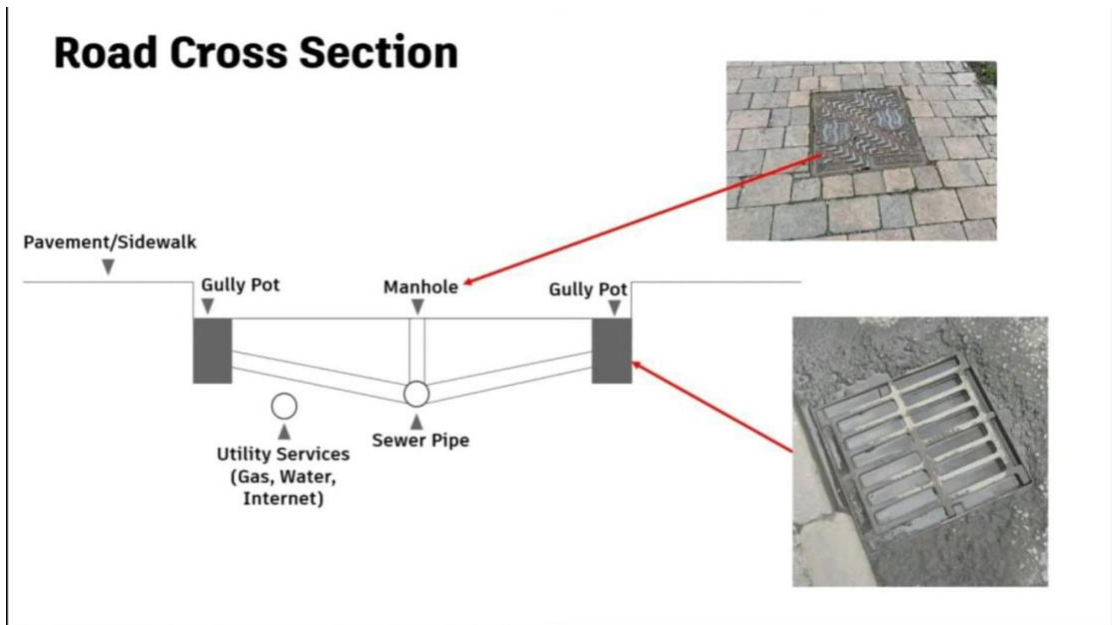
Typical Road Cross-Section Showing Drainage and Utility Components (Manhole, Gully Pot, Sewer Pipe, Sidewalk, and Utility Services)
